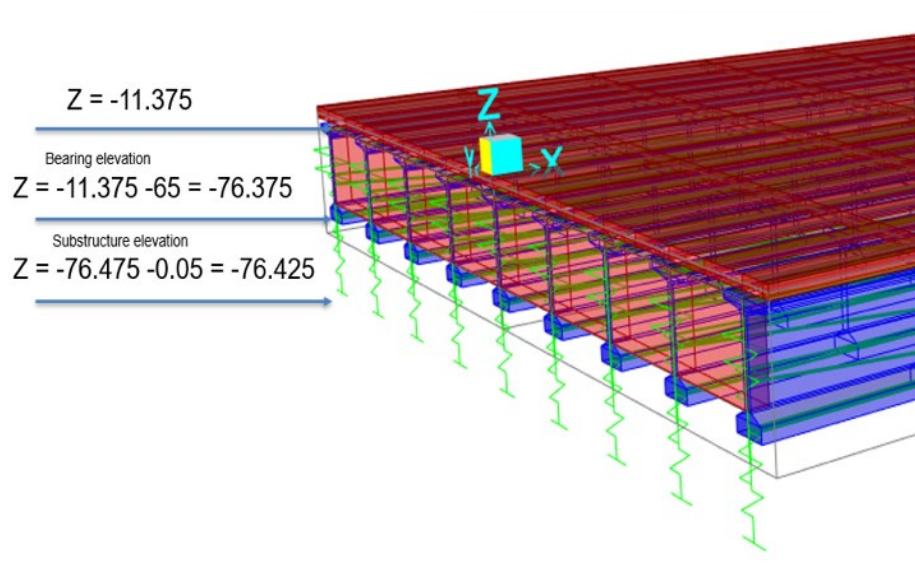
Model. Bearing and substructure elevation in CSIBridge
